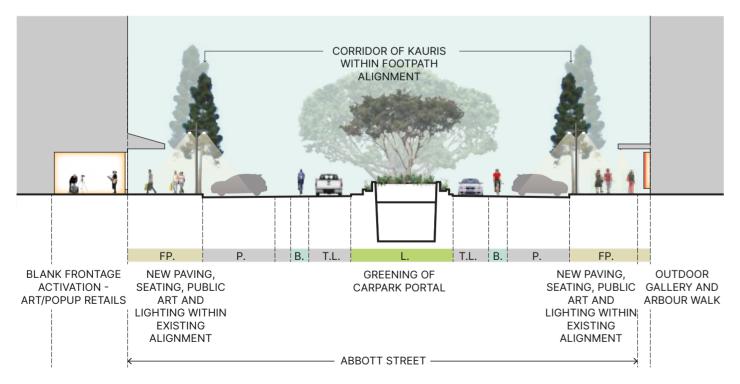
Proposed Abbott Street section (between Spence Street and Wharf Street)
